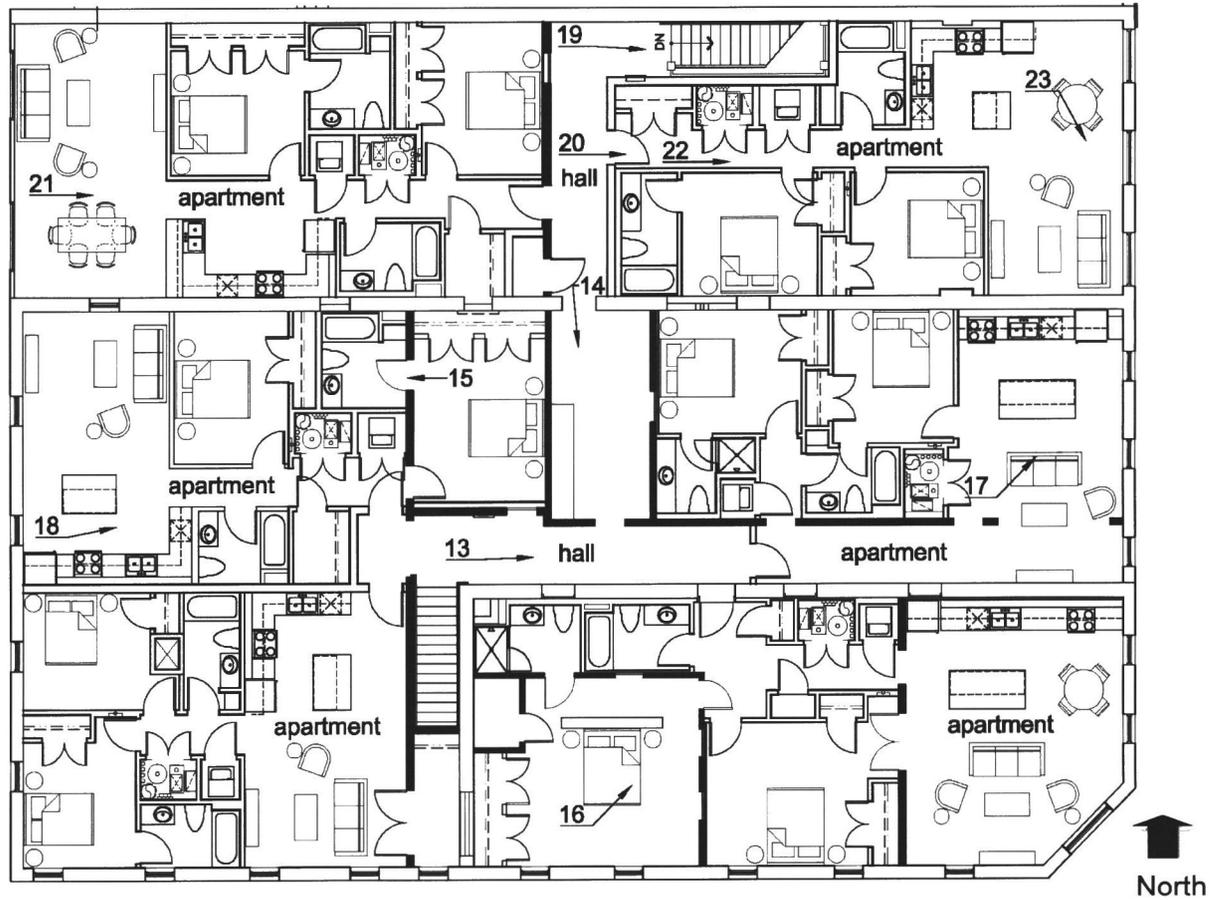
Second Floor Plan Post-Rehabilitation Lots 13-15 – Plan by APMA March 2011 – not to scale.
